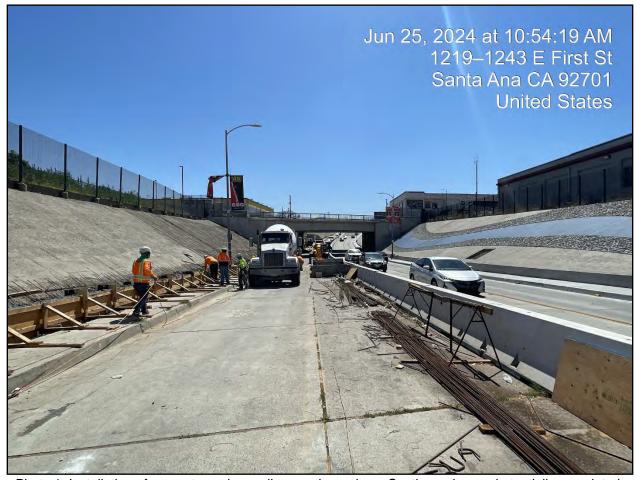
Installation of concrete anchor wall on northern slope. Southern slope substantially completed
